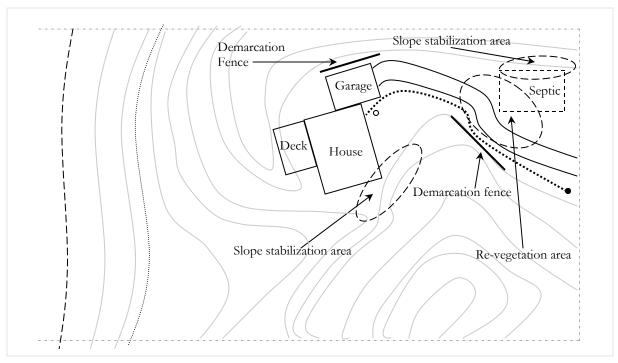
Appropriately sited structures with identified areas for slope stabilization and plant re-establishment areas (septic location used as staging area for construction).
